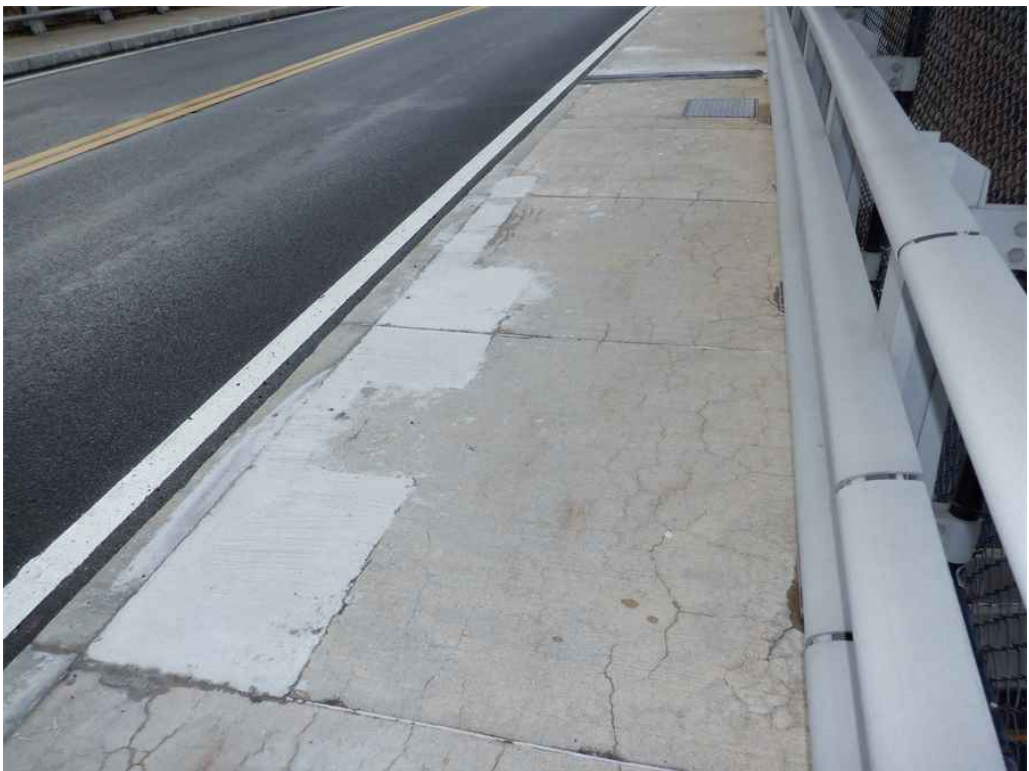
West sidewalk, span 2, looking south - concrete repair patches and typical areas of map cracks.
